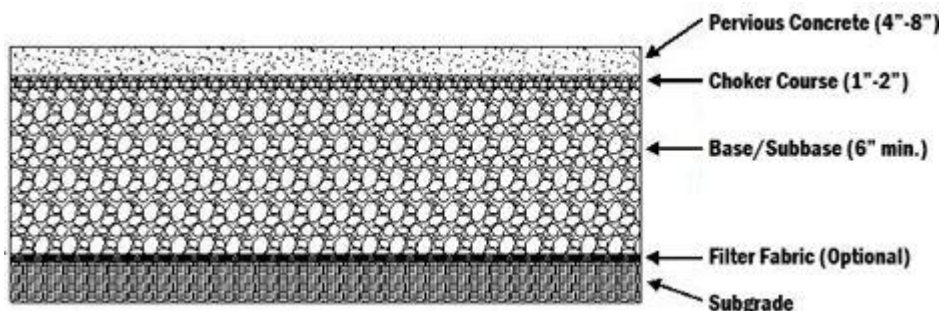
Typical pervious concrete cross-section (US EPA 2009c)
